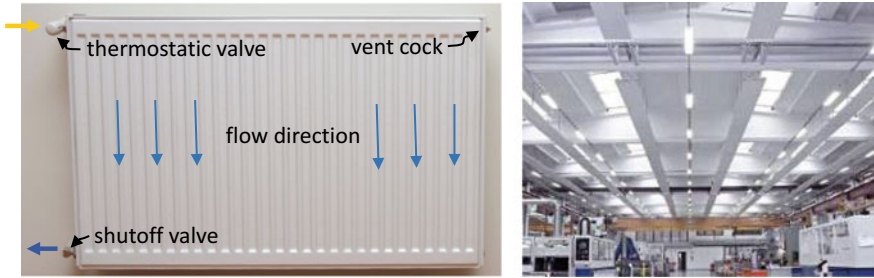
Steel plate radiator with valves and fittings (left); ceiling radiant panels are used mainly in non-residential buildings (right)
